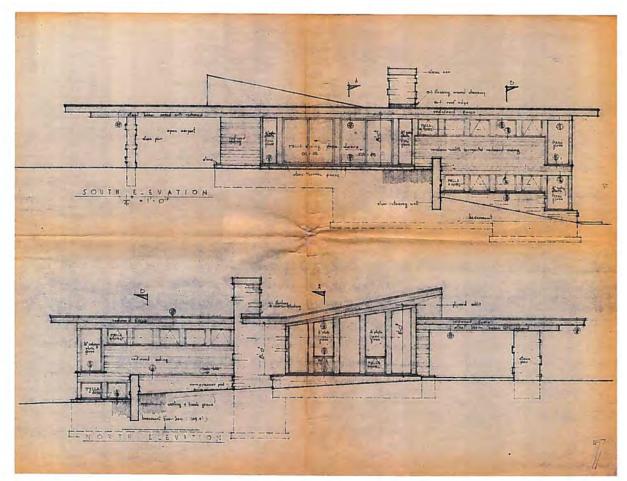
Blueprint for the Hammond House, exterior elevations, ca. 1962. The cardinal directions in the plans differ slightly from the orientation on the parcel. The "South" elevation in Fritz's drawings is listed as "East" in the nomination as it is more of a western orientation. Fritz's "North" Elevation is listed as "West" in the nomination.
